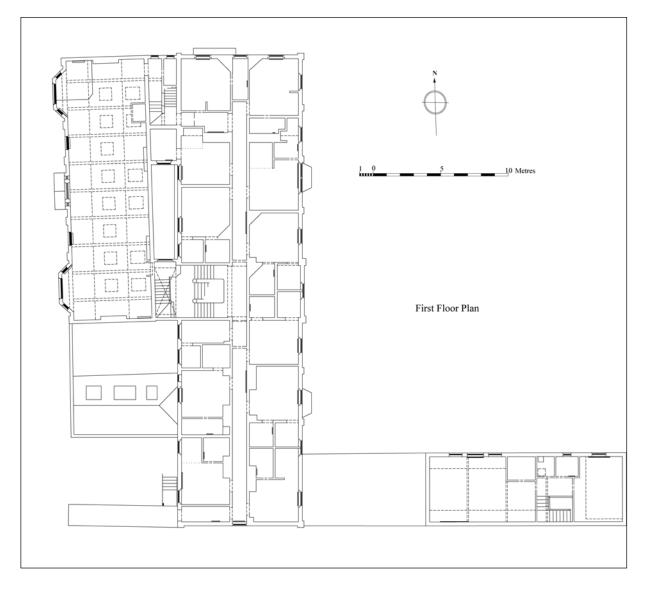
Existing first floor plan modified from plans supplied by MAS Architecture Ltd
